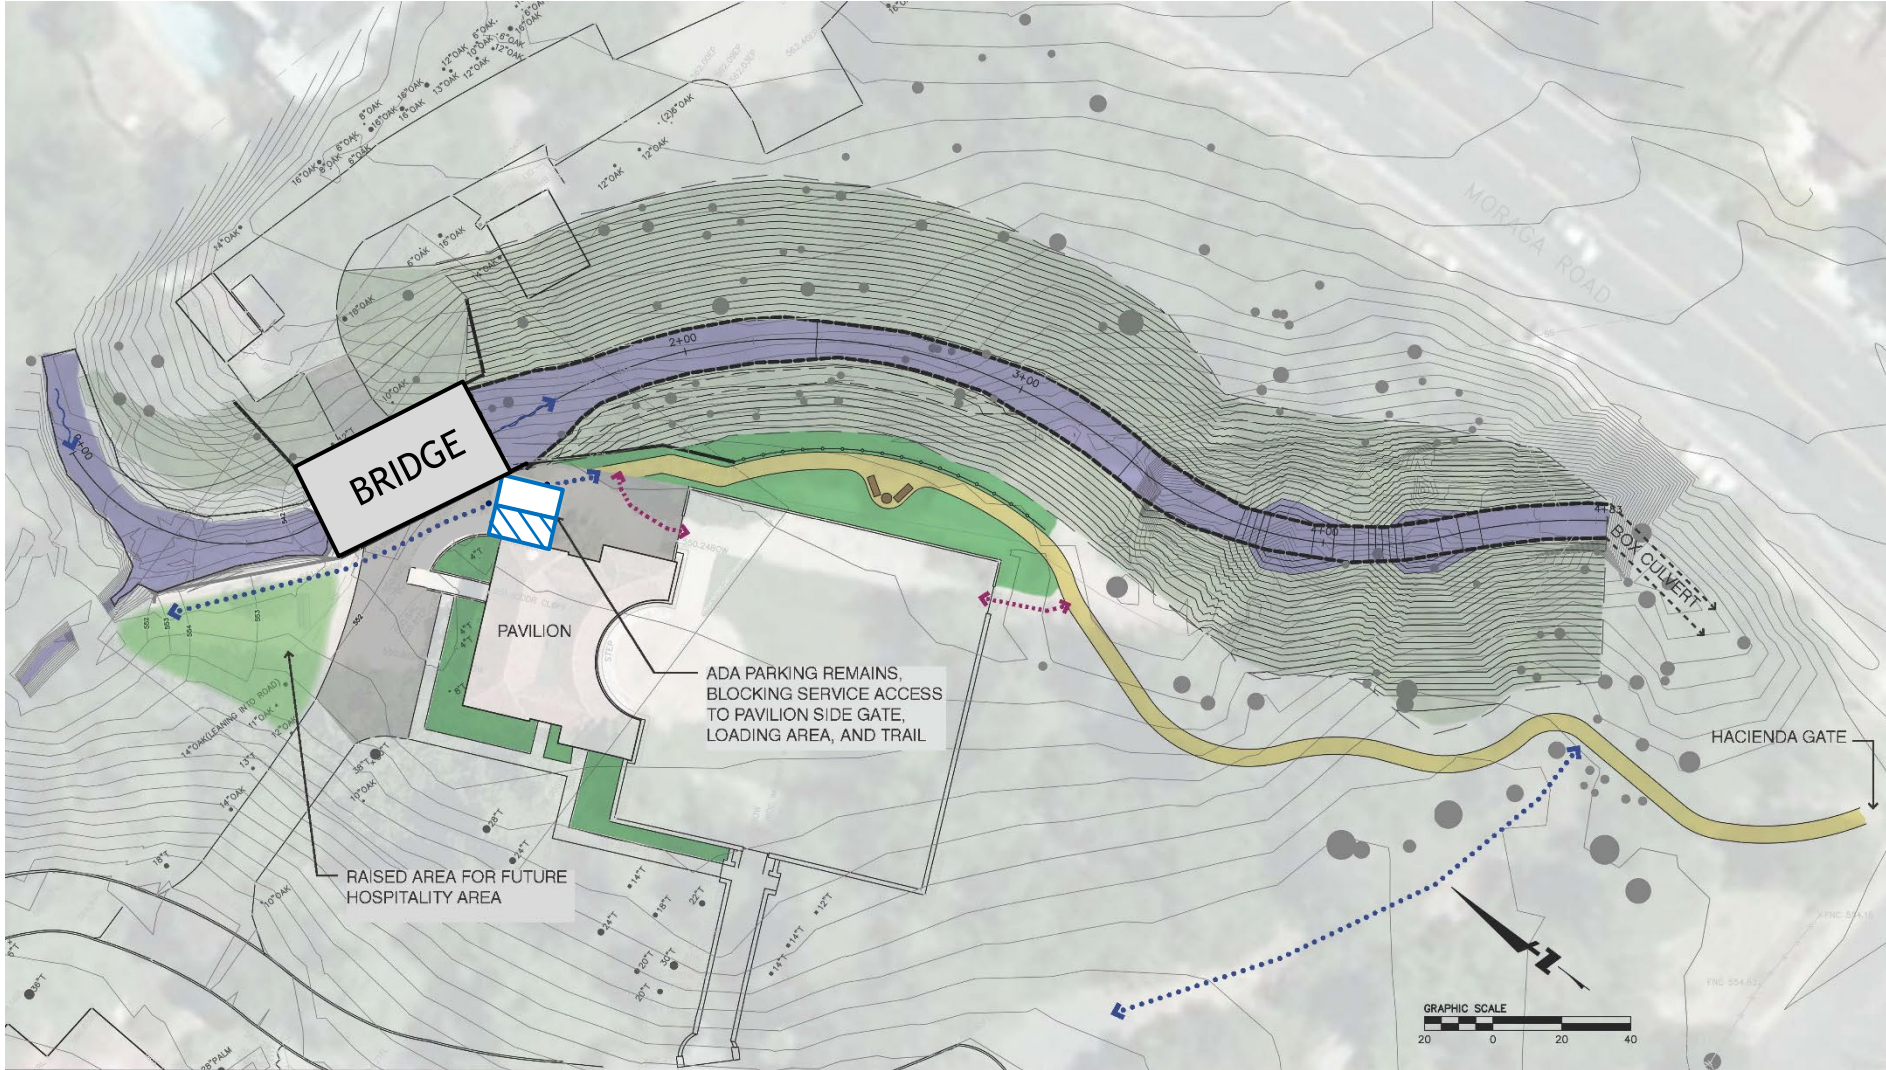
Narrow Bridge with ADA Parking Moved to Front of Building
